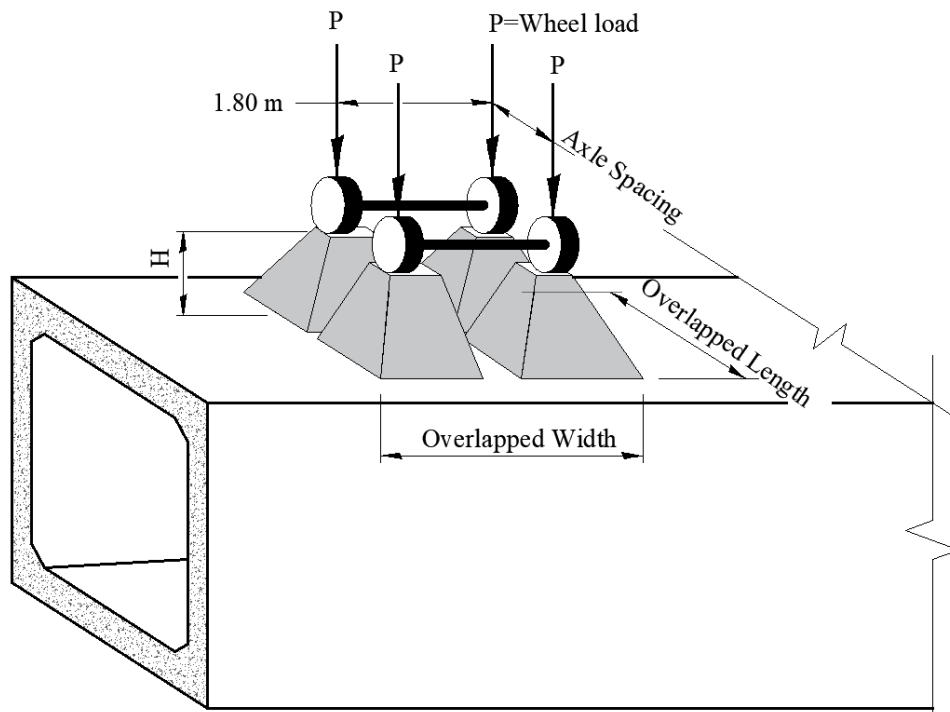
Traffic Travelling Parallel to Span (600 mm of fill or greater show load projection overlap of four wheels) [38]
